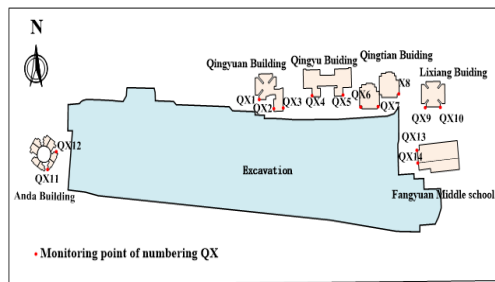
Plan view layout of inclination monitoring points for the adjacent high-rise buildings.
